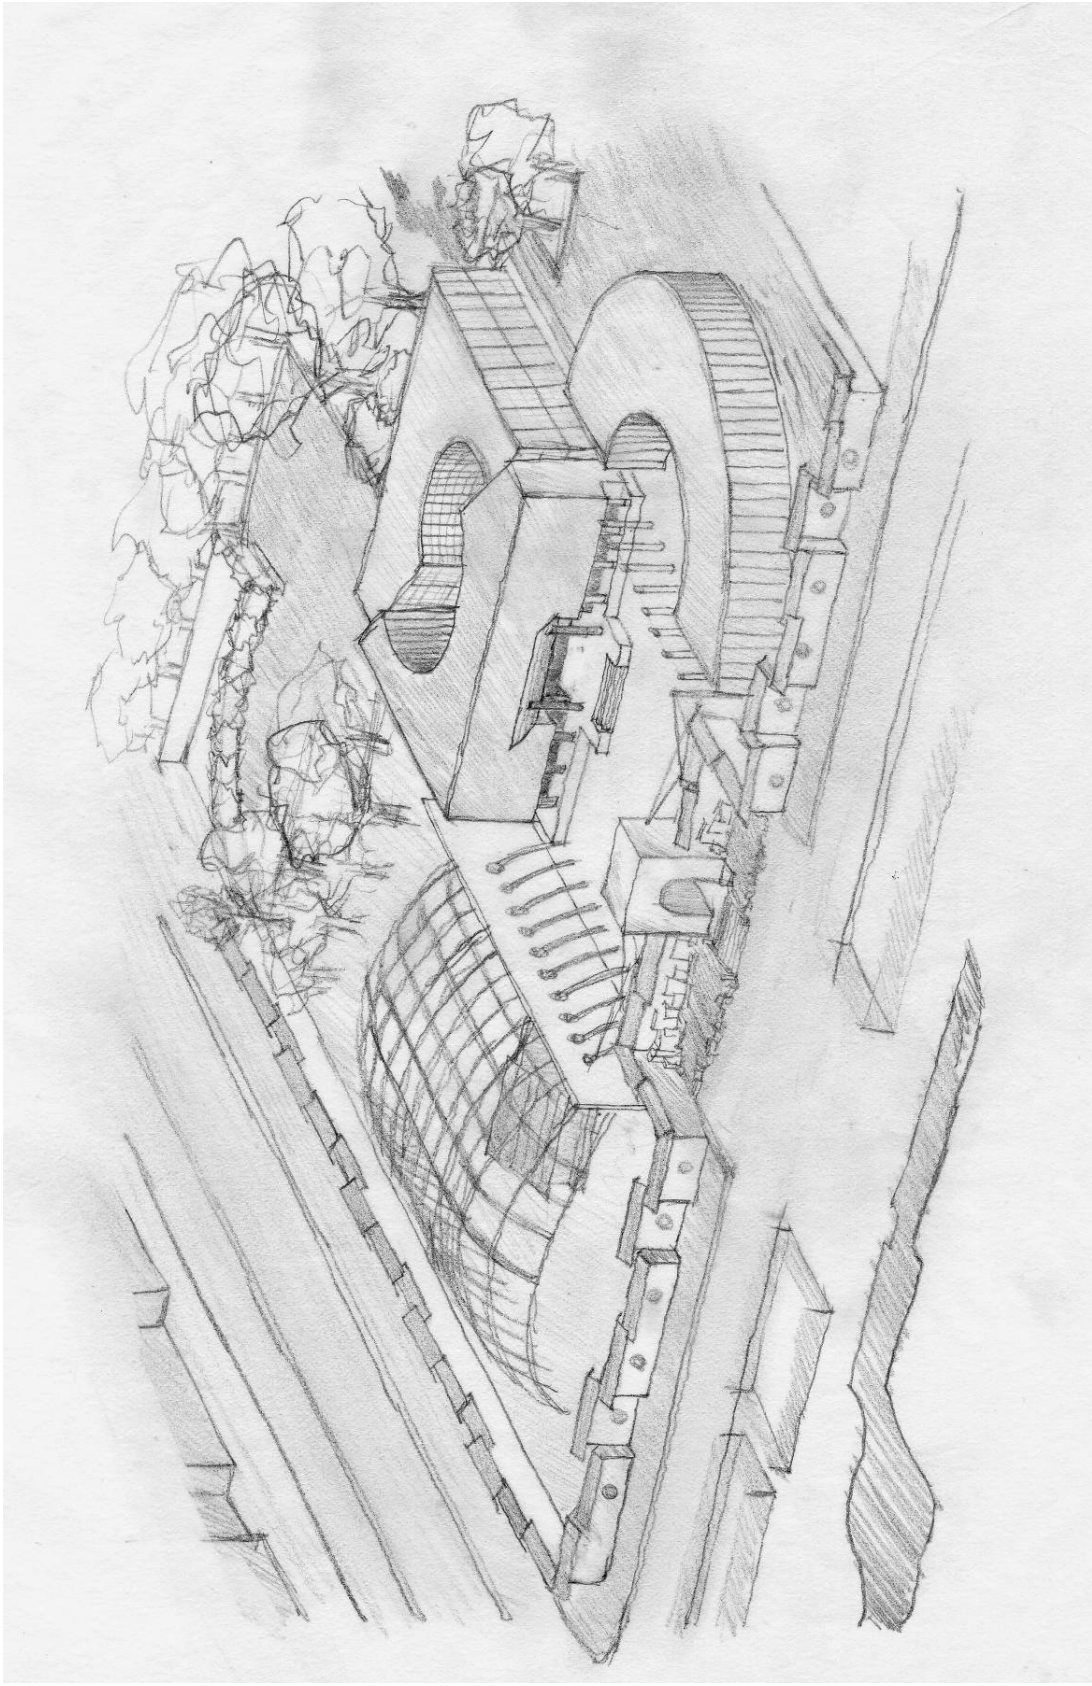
Conceptual Drawing of Author's proposal of New Suzhou Museum. Facing south on Dongbei Street. See figure 6-8. Site plan.
